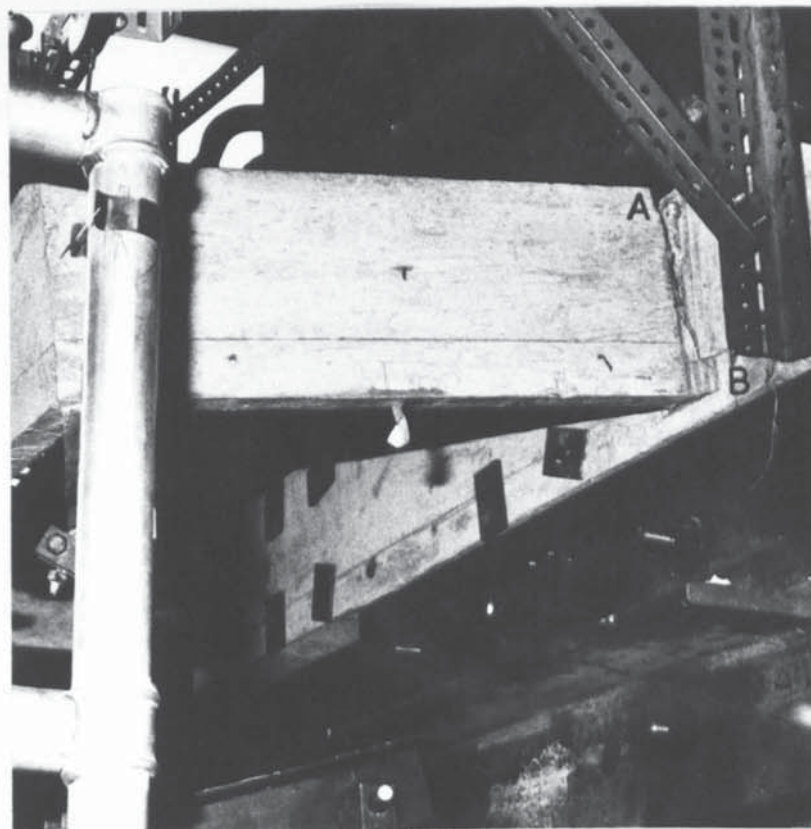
FAILURE OF TEST STRUCTURE 2
